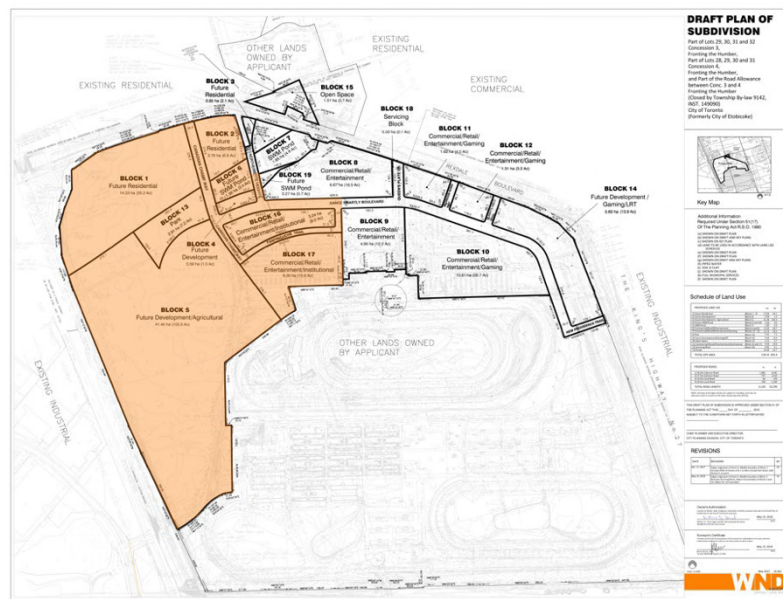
Area of Approved Draft Plan of Subdivision Proposed to be Revised
